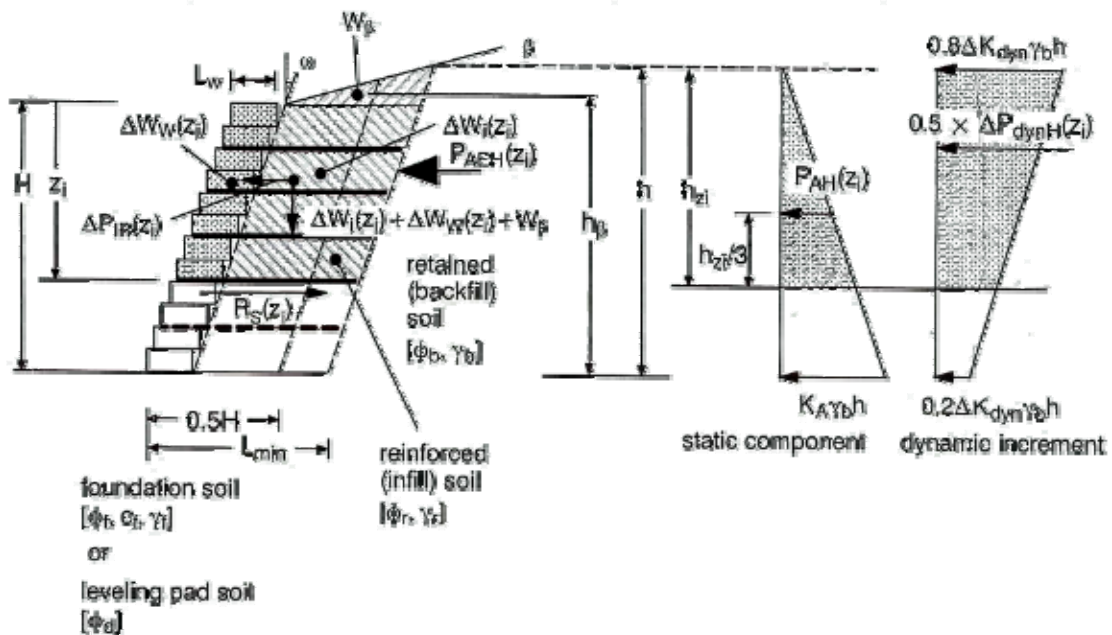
Geometry and forces used to calculate internal sliding of reinforcement layers in reinforced SRW structures [17]
